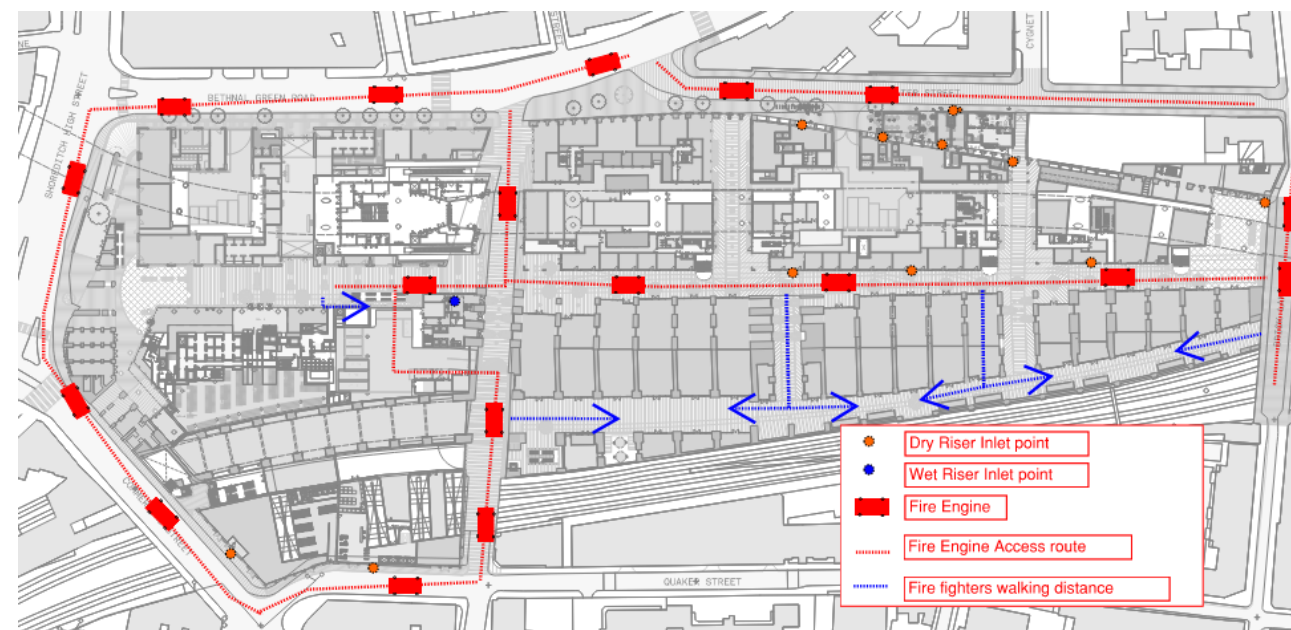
Fire-fighting vehicle access route at Ground Floor.
